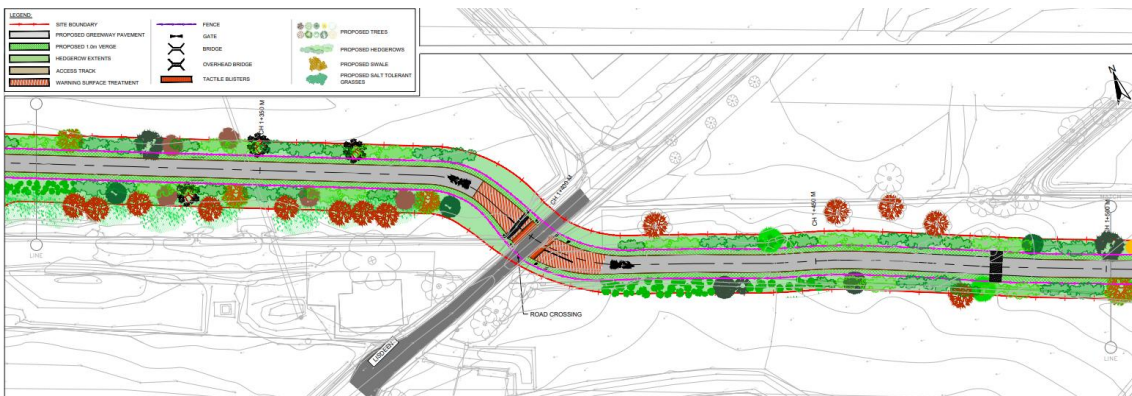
Excerpt from Figure 4.5 in Volume 3 of the EIAR illustrating how the proposed development will divert around an existing dwelling and cross the L2018.
